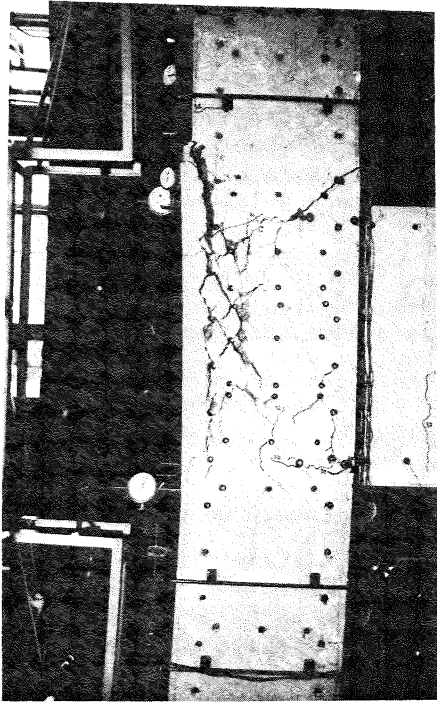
Reinforced Concrete Exterior Beam-Column Joint Showing Splitting Cracks at Outer Longitudinal Column Bars
